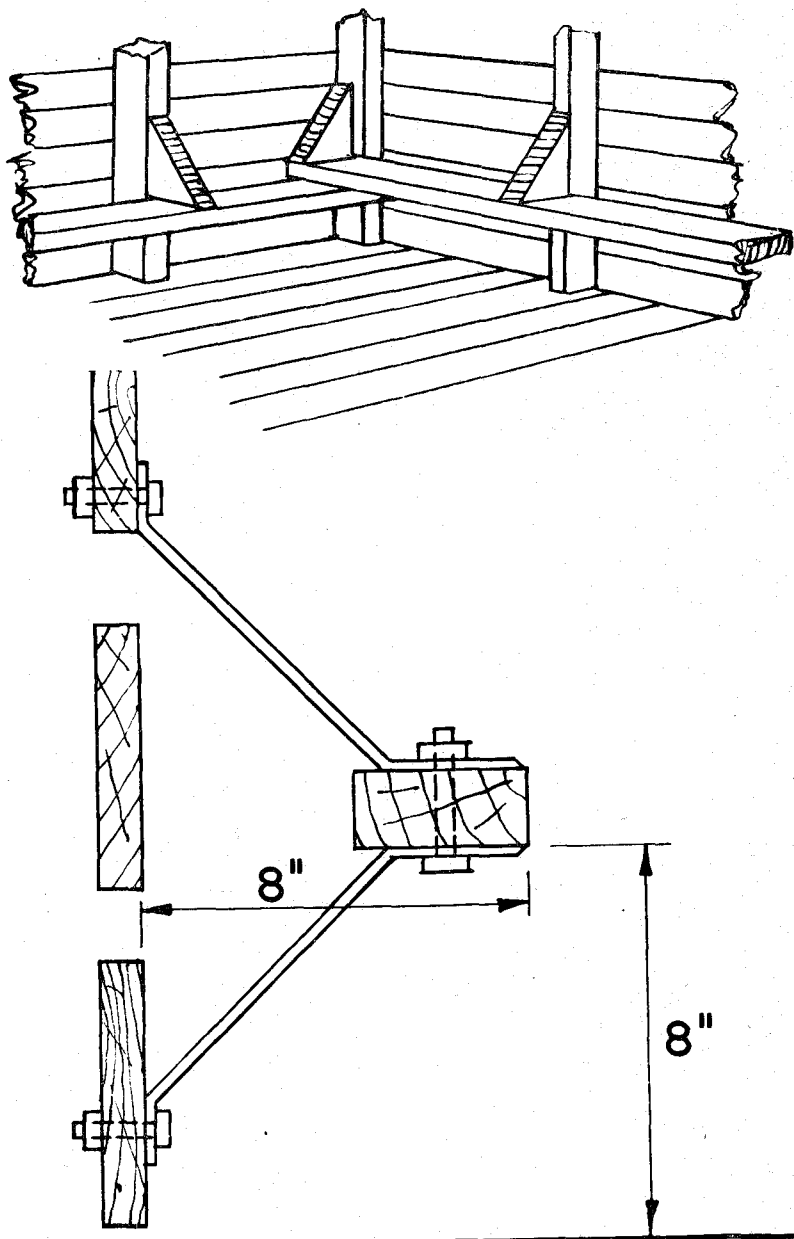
Method of constructing fenders or guard rails. Fender or guard rails should be fastened to wall securely. They serve as a protection to little pigs from the sow.
